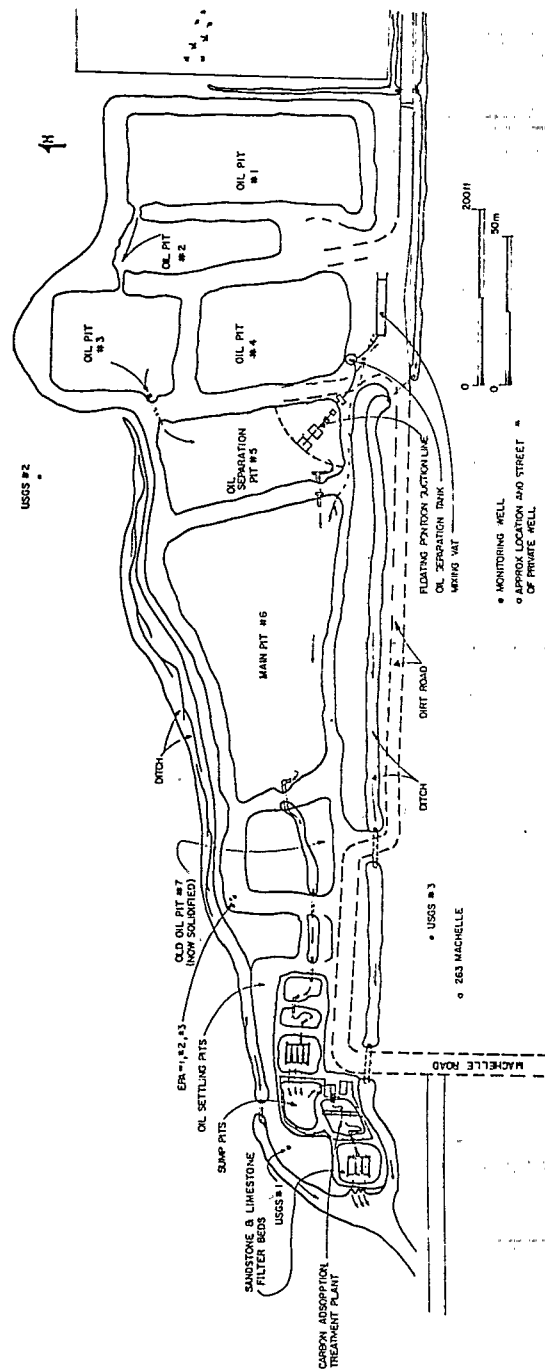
Layout of Whitehouse oil pits and diversion ditches (1976).
